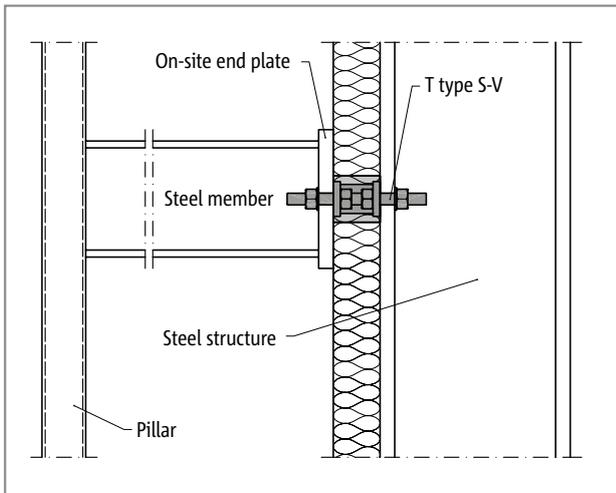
Schöck Isokorb® T type S-V for supported steel structures
